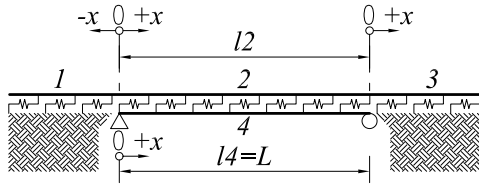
A simple girder with a fixed bearing on one side of the bridge.
